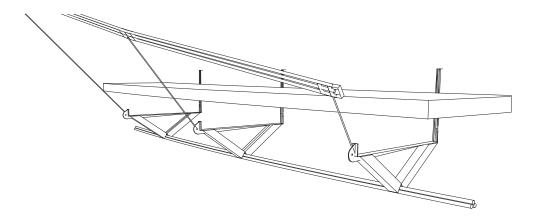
Assembly view of the connection between the bridge deck and steel beam
